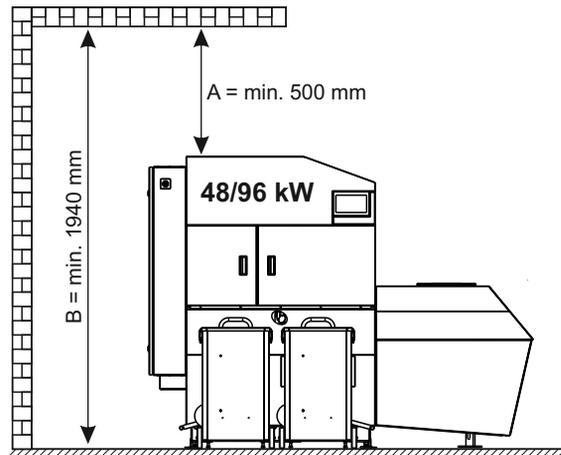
Minimum distances from the room wall and ceiling for BIO-SC 48-96
